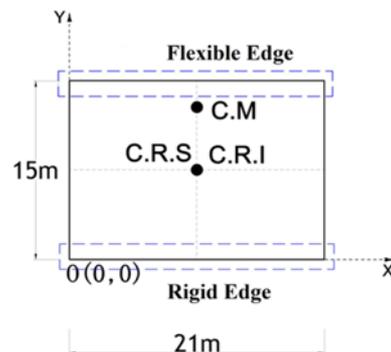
C.M., C.R.I., C.R.S., Flexible Edge and Rigid Edge on the Plan of Structural Models
